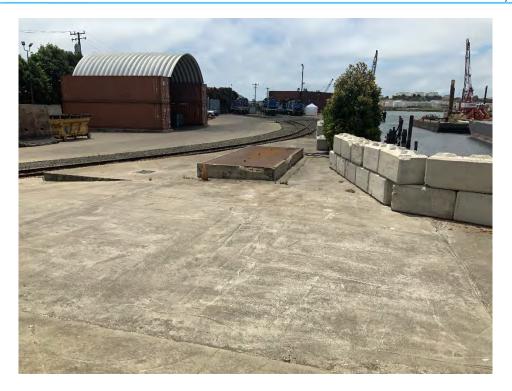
Looking south toward SW-6. No significant crack or deterioration noted in the area.
